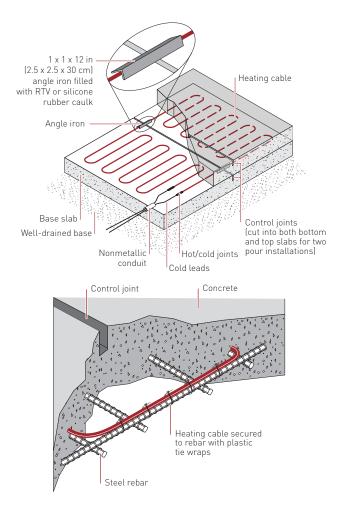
Method of crossing crack-control joints with MI heating cable in concrete slabs
